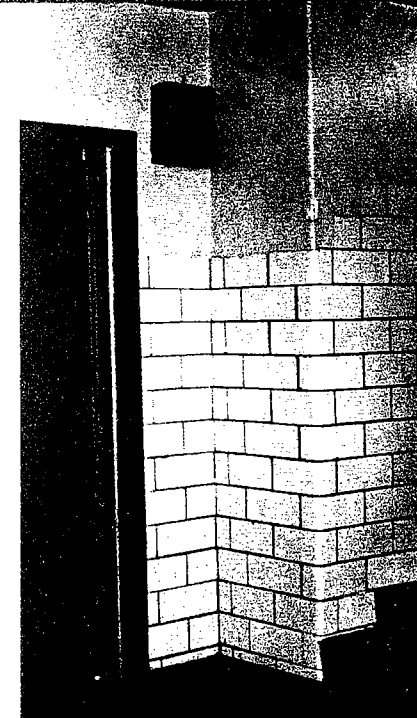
Entry Lobby at Breukelen. View of entrance lobby showing a portion of the elevator door and the two steps which separate the lobby from the corridor serving the ground-floor units. (Photo by author)
